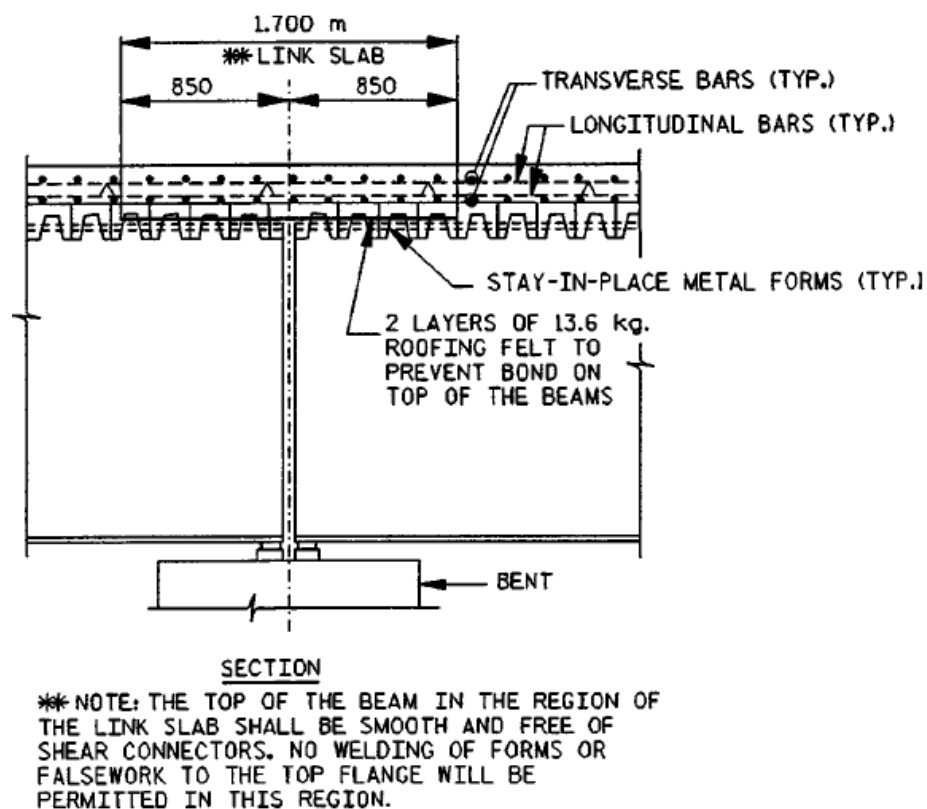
Section of link slab utilized in the bridge (Wing and Kowalsky, 2005)
